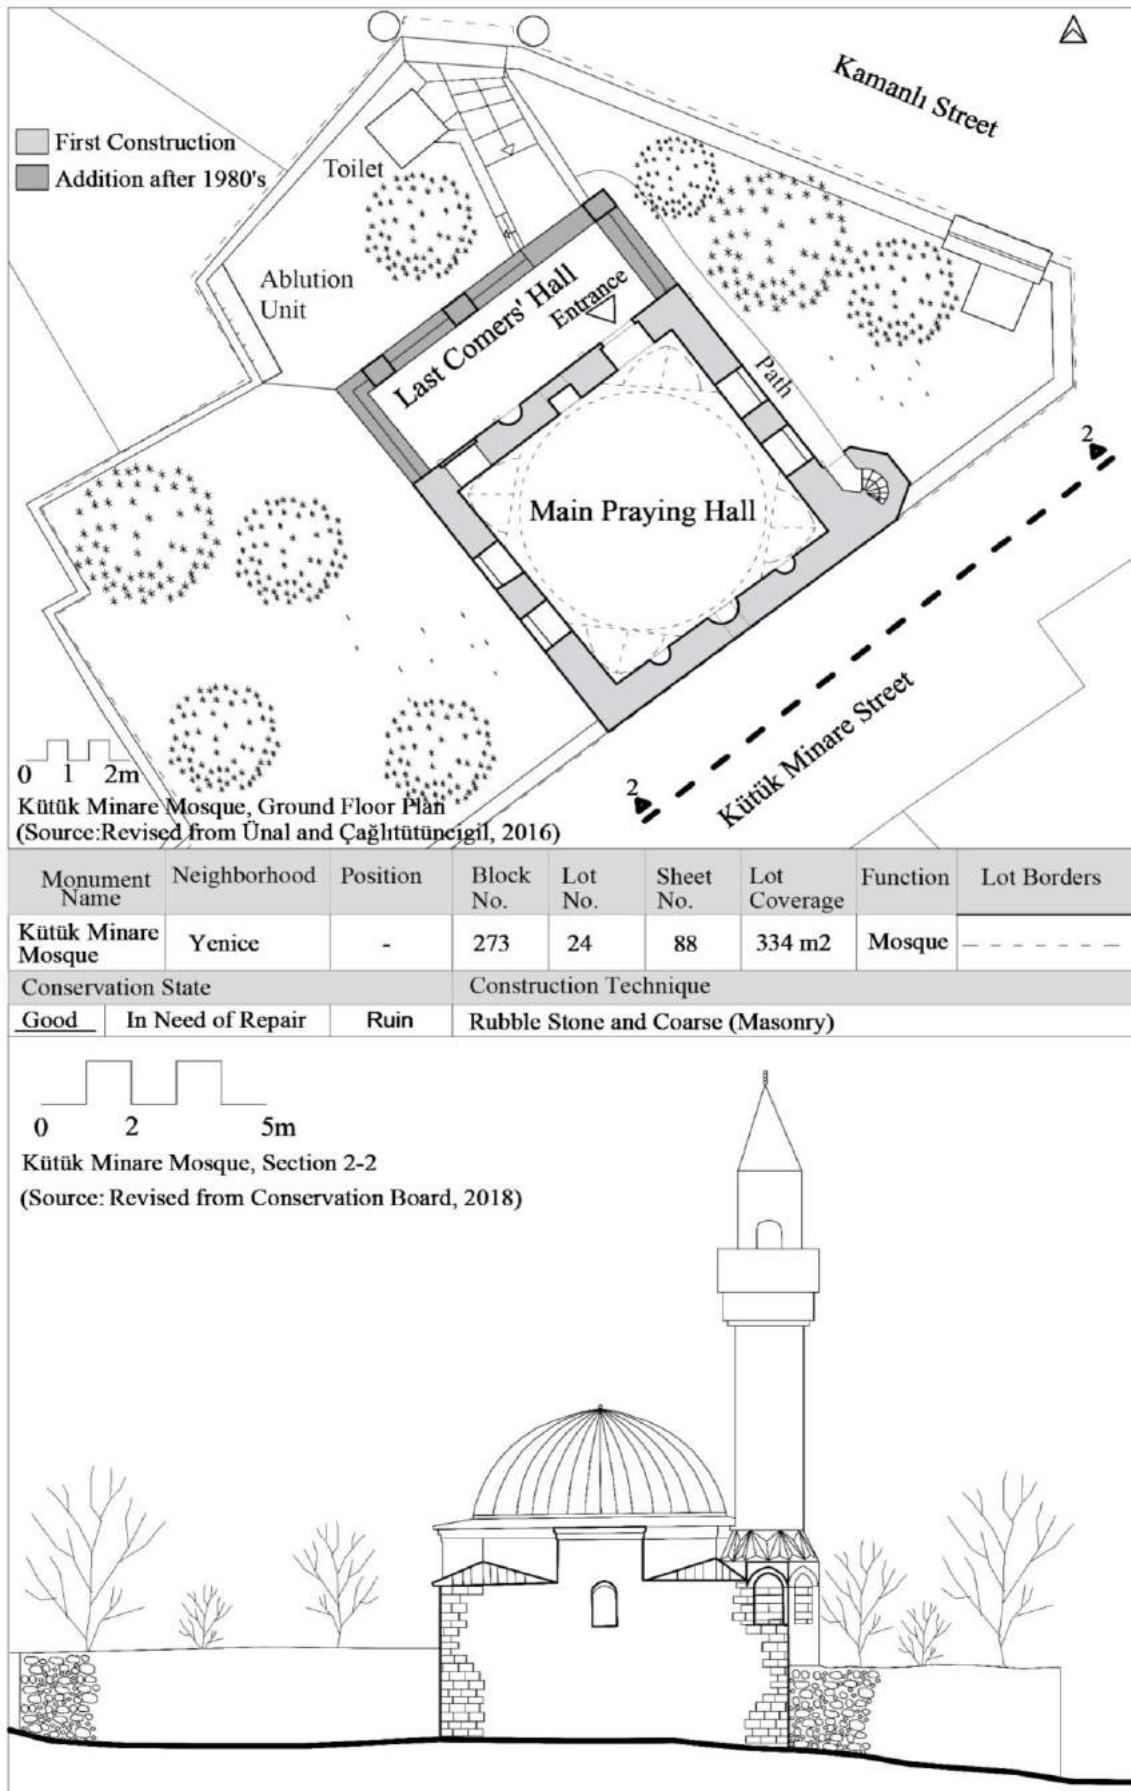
Ground floor plan and silhouette section, Kütük Minare Mosque
